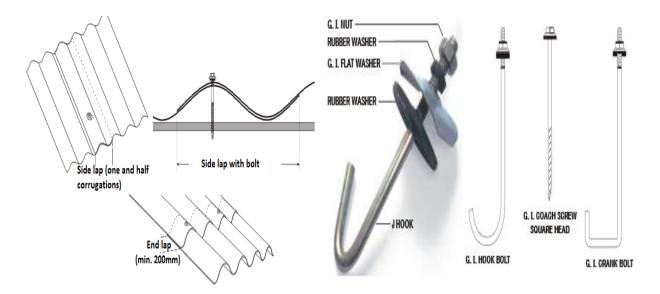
Laps in CGI sheet metal and types of hooks & bolt (source: Tata steel limited)
